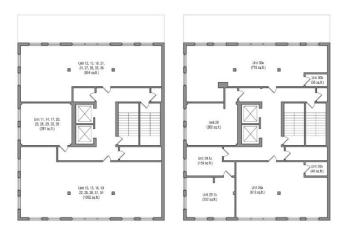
, 247 (left to right, top down): Building 8, tenth floor (1926); same floor (1981). 1'' = 32'. North is to the left.
